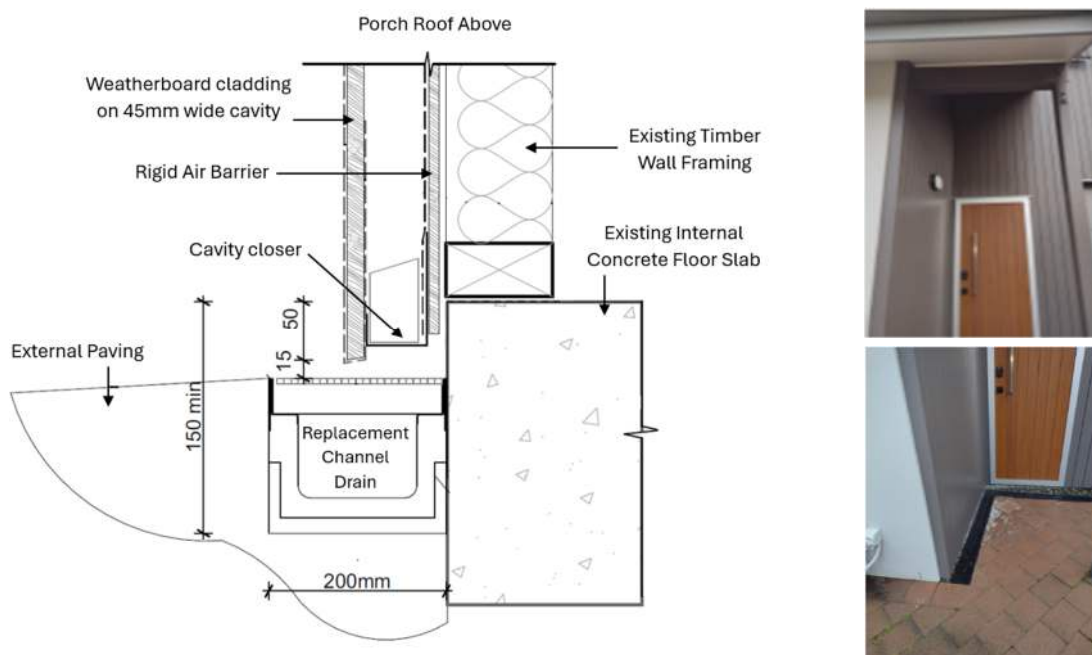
Detail 1 – as-built cladding detail (not to scale) and photo along northeast elevation of rear garage
